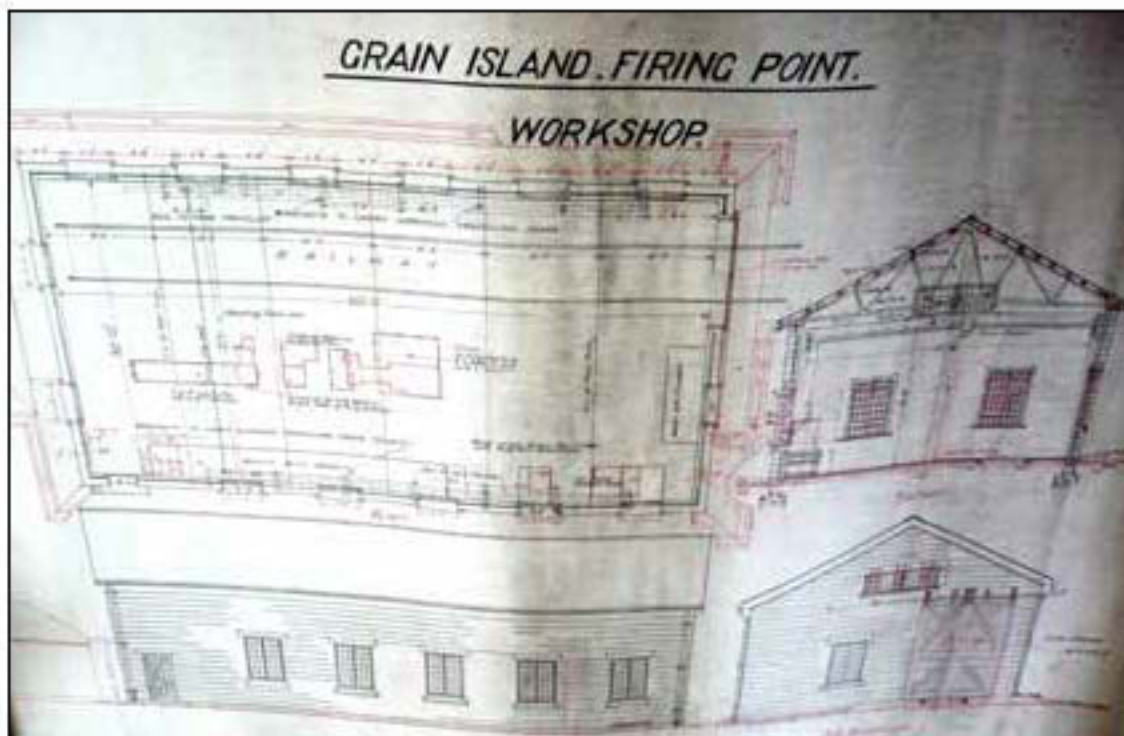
Detail of 1920 drawing (TNA WO 78/4370), showing the main workshop building in plan and elevation, © The National Archives.
